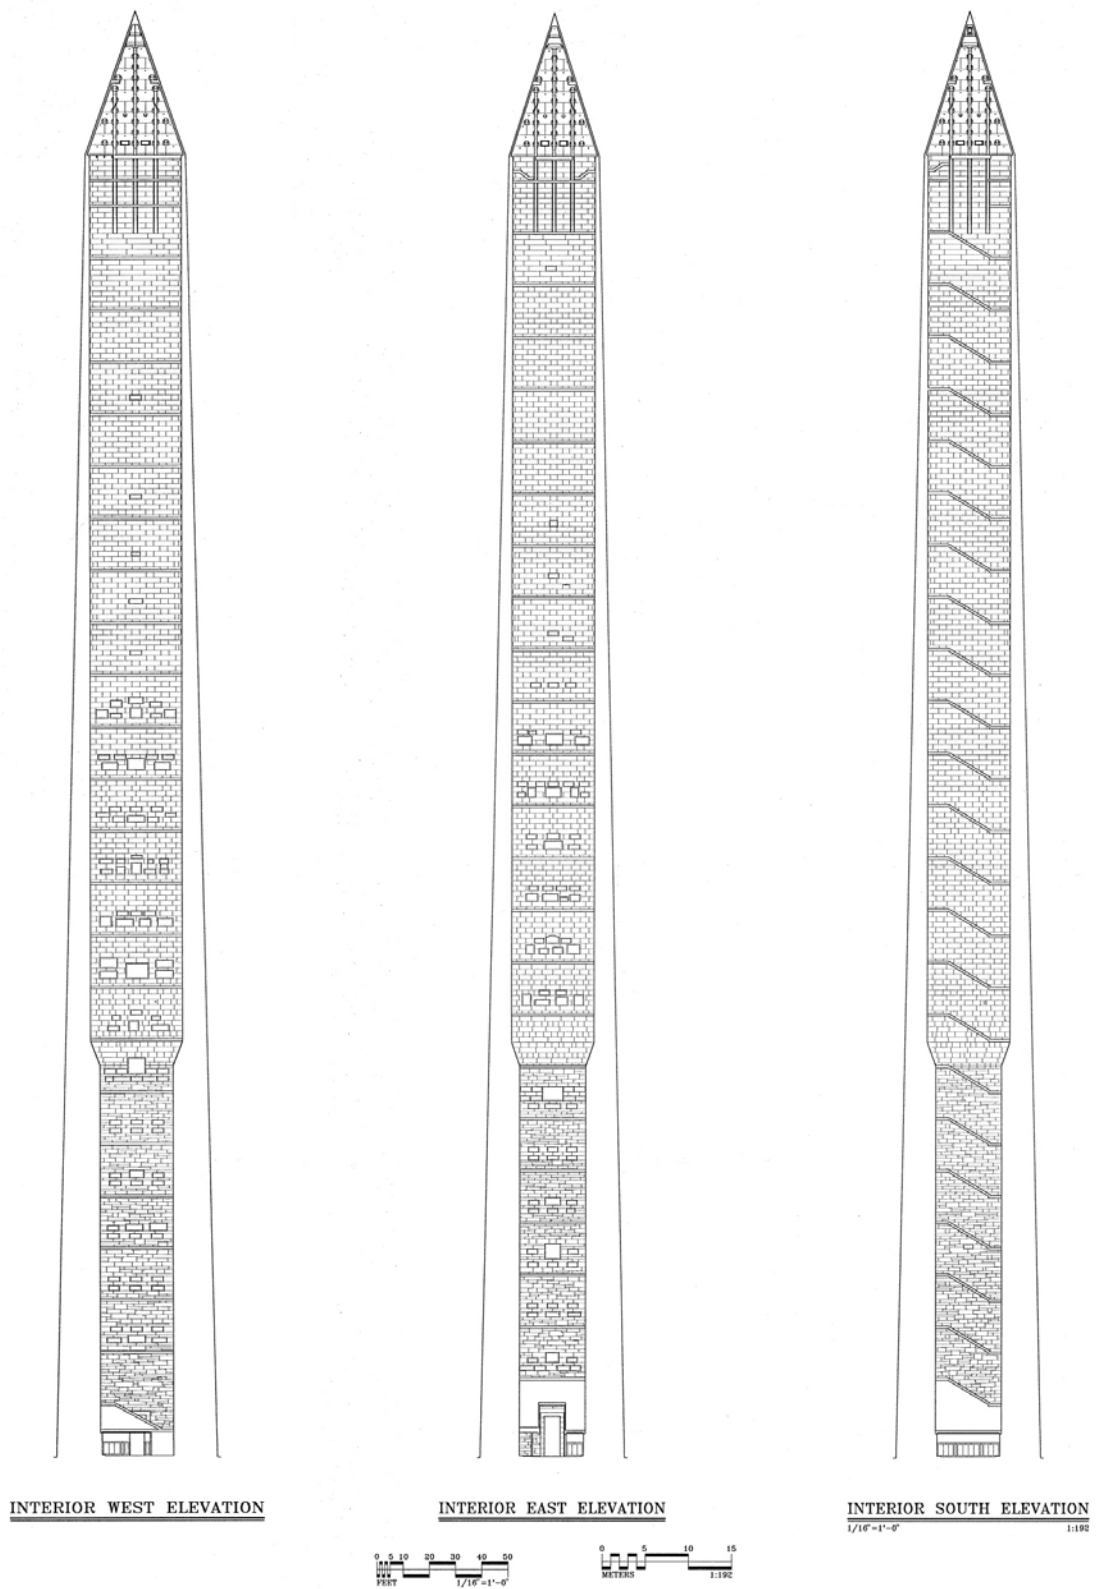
Interior west elevation, east elevation, and south elevation. [Composite image from Sheets 22, 28, and 25, Historic American Buildings Survey, HABS DC-428; Prints and Photographs Division, LOC.]
